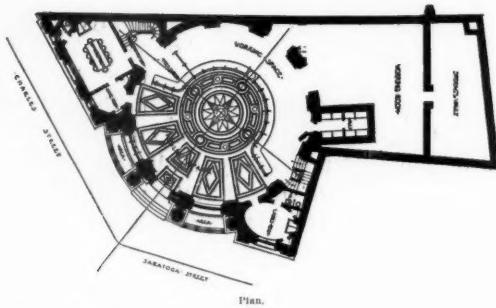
PLAN, METROPOLITAN SAVINGS BANK,
